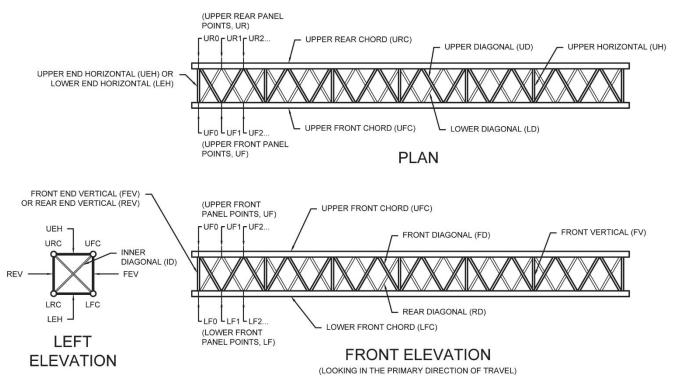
Methodology for Panel Point Numbering and Component Labeling of Four Chord Truss Overhead Span and Cantilever Sign Structures without Splices
